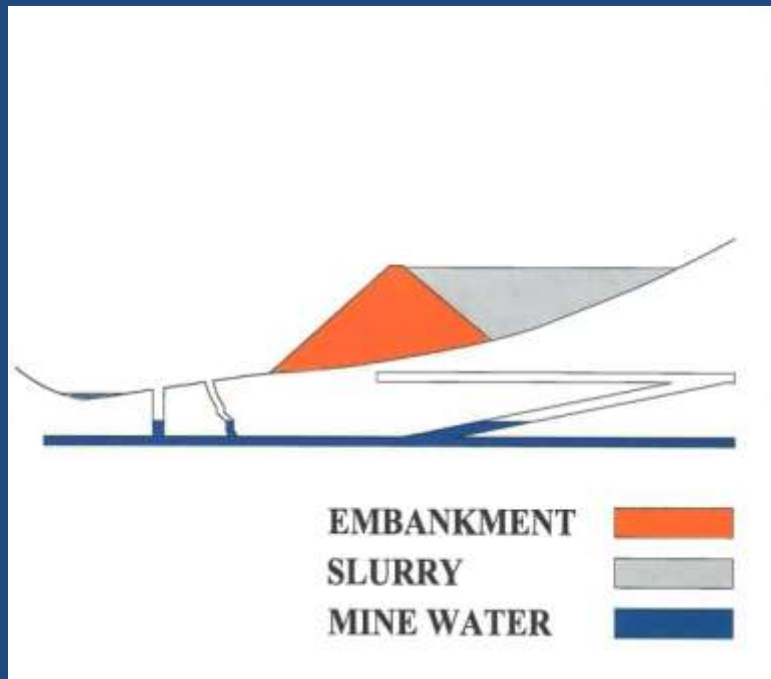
Cross section depicting of slurry cell construction above capped impoundment and coal seams subjacent to, and below the structure.
